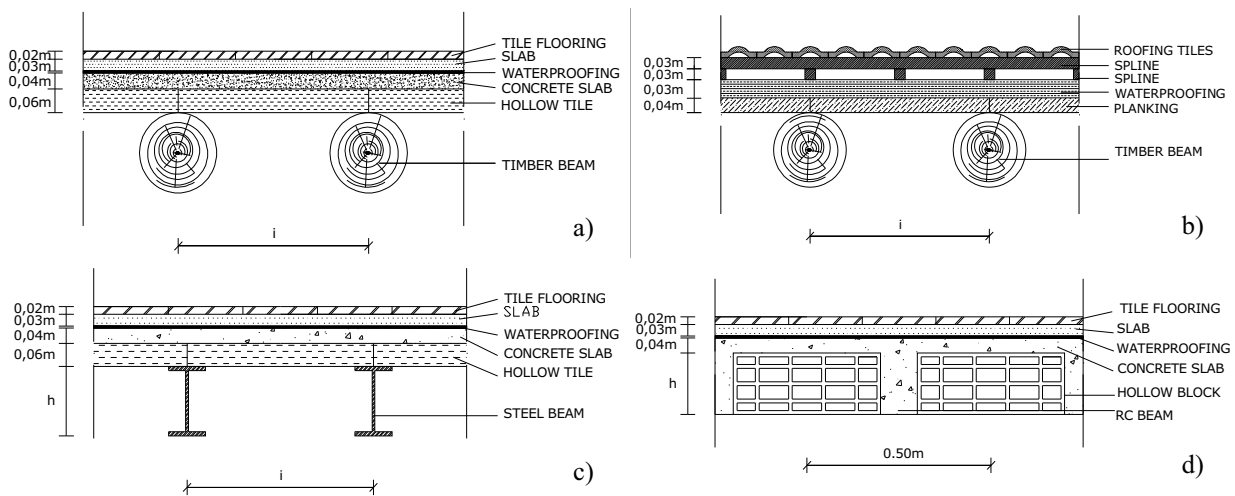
Main Vesuvian roof types: a) not ventilated timber; b) ventilated timber; c) steel; d) RC
